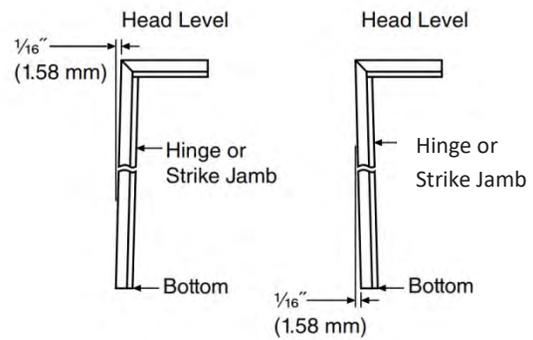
shows examples of the accuracy to be maintained when setting frames.
